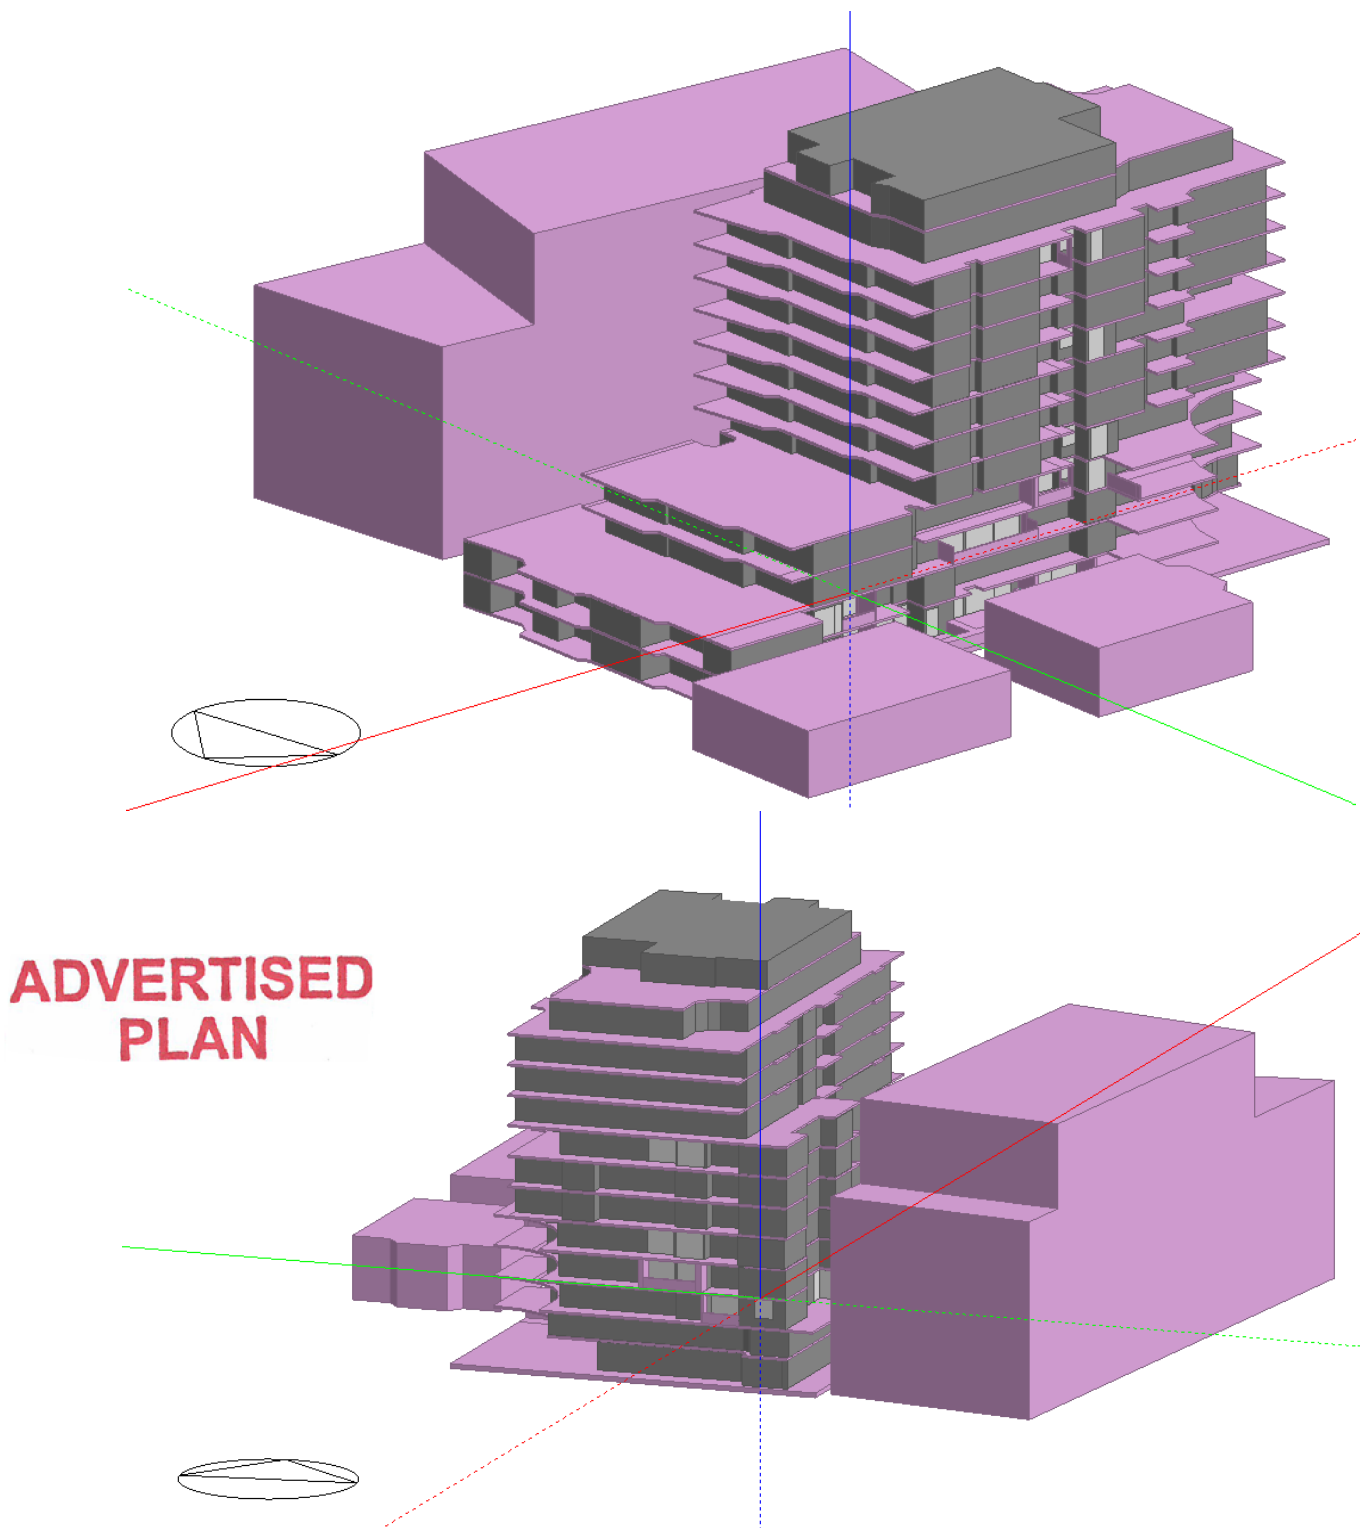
DesignBuilder model of the proposed development and adjacent existing buildings.
